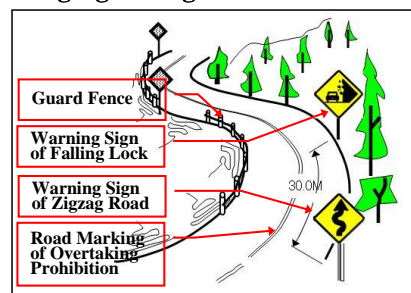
Typical Combination Plan of Road Safety Facilities at the Hazardous Locations
